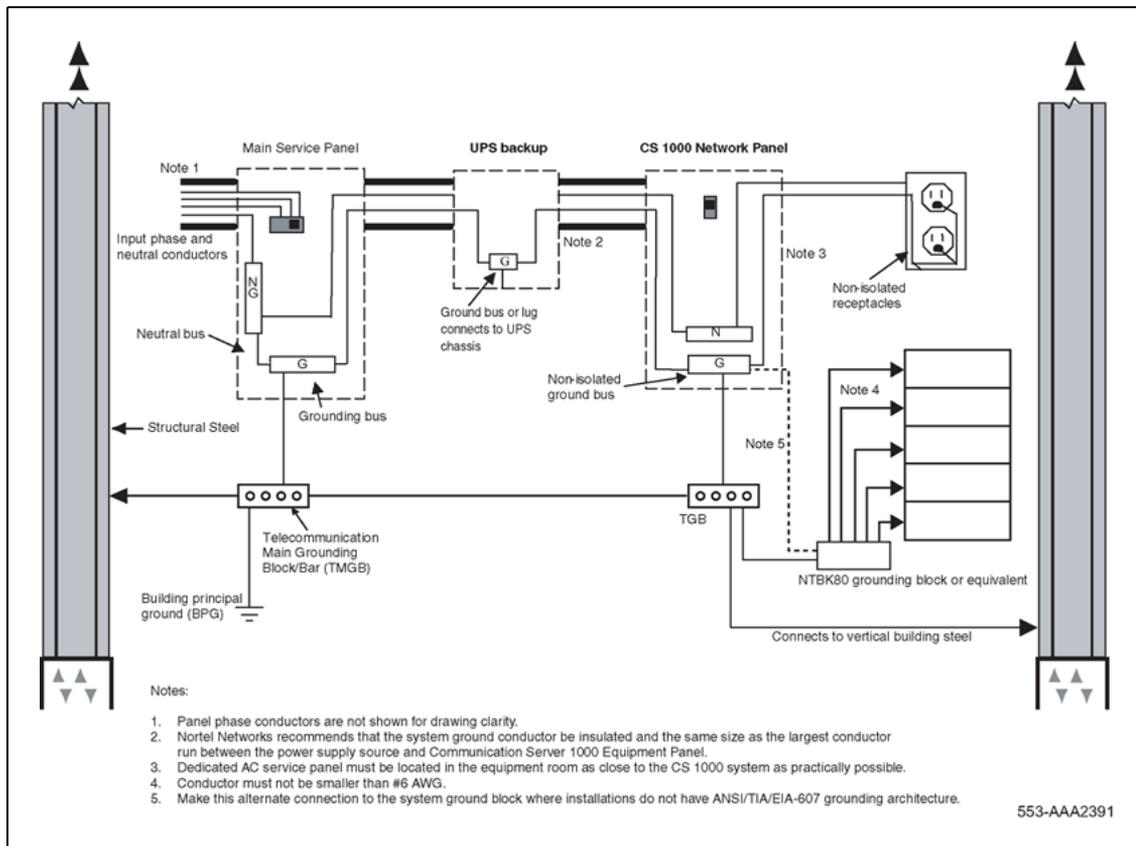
"Typical UPS wiring plan" (page 175) shows a typical UPS wiring plan.
